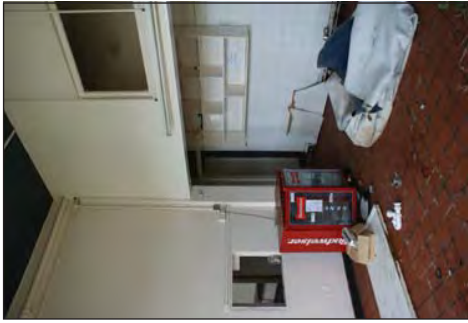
Ground Floor Kitchen Located In 1919 Extension
